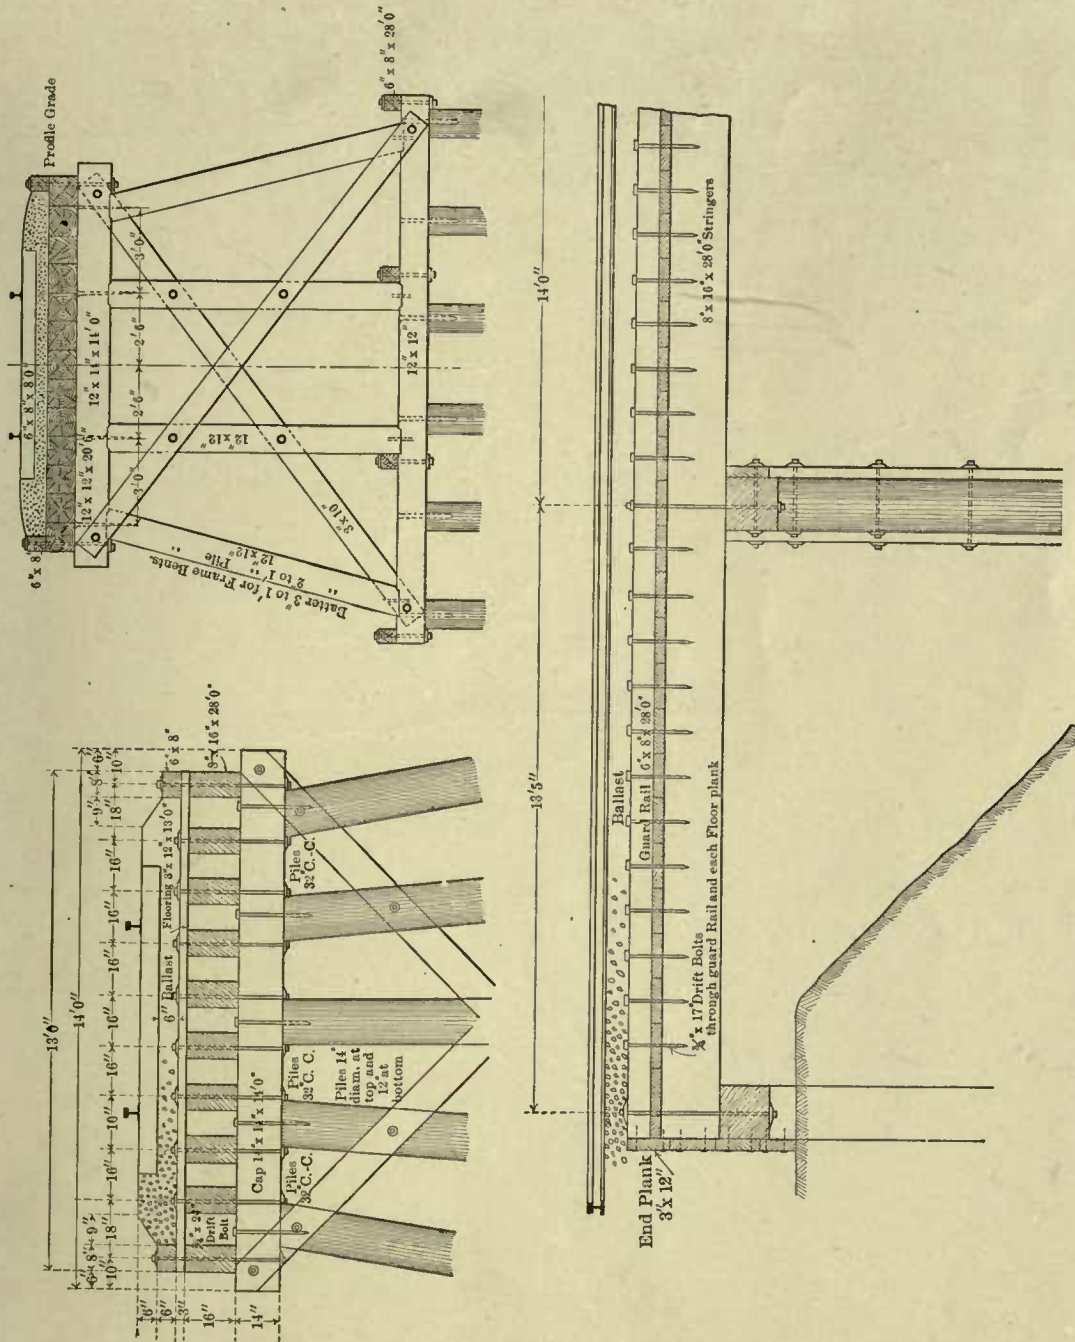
PLATE LXV.—BALLASTED FLOOR TRESTLE, EL PASO & SOUTHWESTERN RAILWAY.
